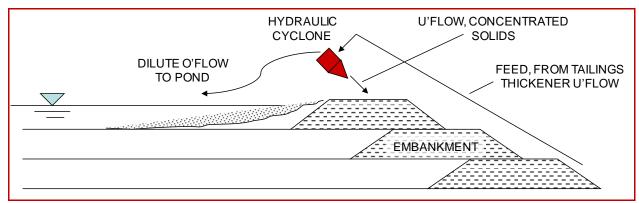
Slurry Dewatering at Tailings Pond by Hydrocyclone
